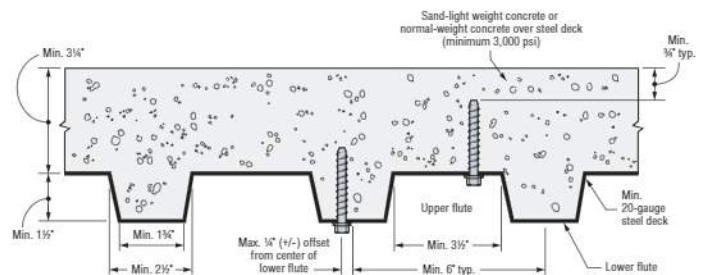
Installation of 1/4"-Diameter Anchors in the Soffit of Concrete over Metal Deck
